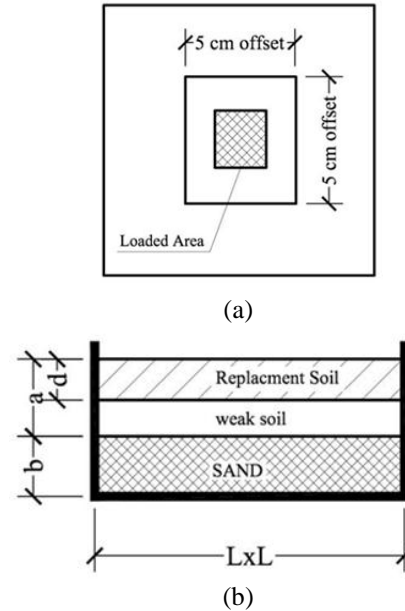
Replacement method details and its projection from footing: (a) plan, (b) section
